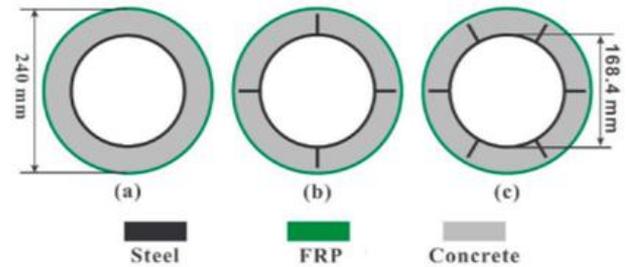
CFDST specimens with FRP (A) Without stiffeners (B) With four steel stiffeners (C) With six steel stiffeners [55]
